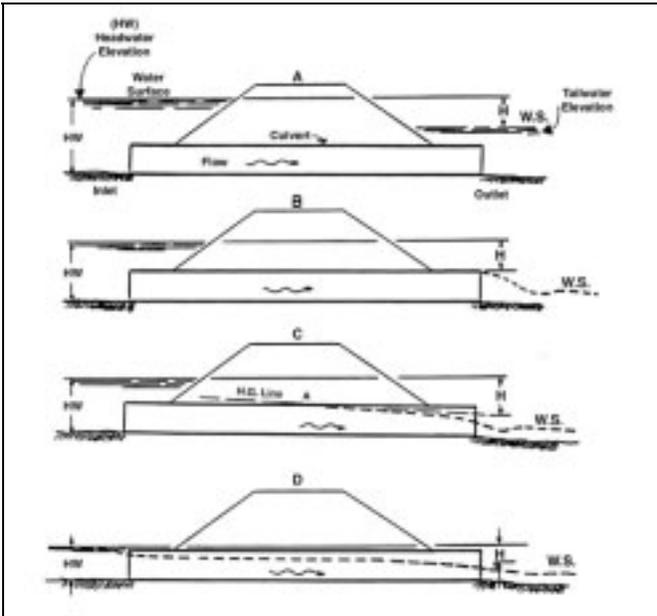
shows some examples of culverts crossing roadways (the views represent cross-sections of the roadway). Note that the culverts can carry flow under a variety of conditions. The rate at which water flows through a culvert can depend on the inlet shape and material of the culvert, the slope of the pipe, the roughness of the pipe, the depth of water at the inlet of the culvert (headwater depth) and the depth of water at the culvert outlet (referred to as the tailwater condition at the culvert). Design calculations for culverts should include an accounting of these factors. Sometimes, the inlet shape and material controls the rate of flow in a culvert, regardless of the conditions in the pipe barrel or downstream. In this case, the culvert is said to flow under inlet control. If the control of flow in the culvert is not governed solely by inlet conditions, the culvert is said to flow under outlet control. A correct culvert design calculation will either include an analysis of which condition prevails, or will consider both conditions, and select the culvert size and configuration that addresses the most conservative condition.
